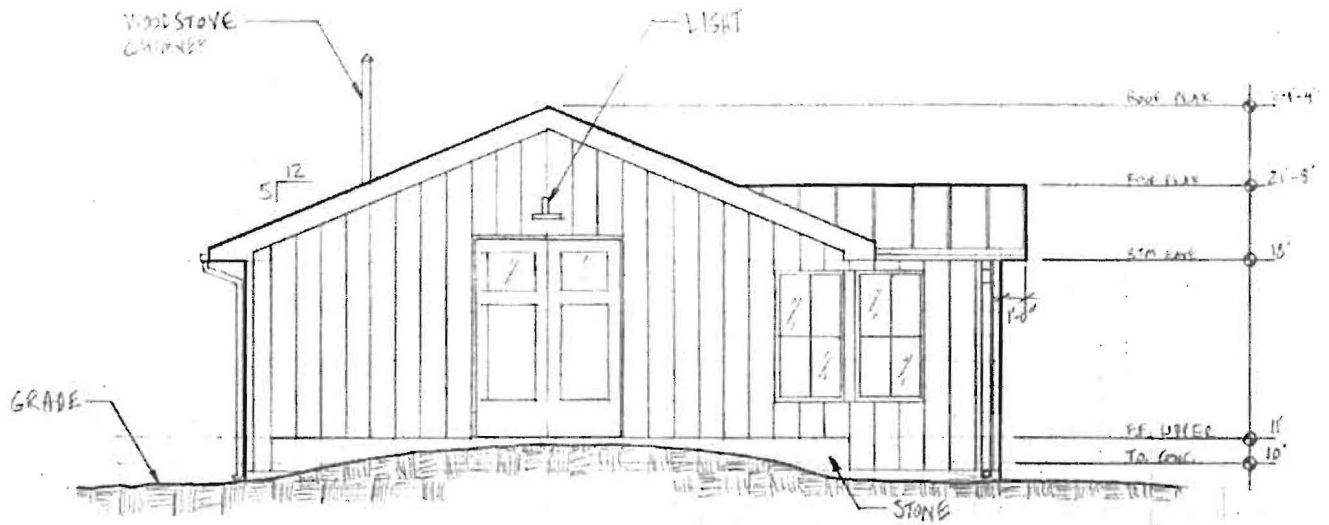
D.3 – West Elevation, Proposed Bank Barn / Accessory Structure
